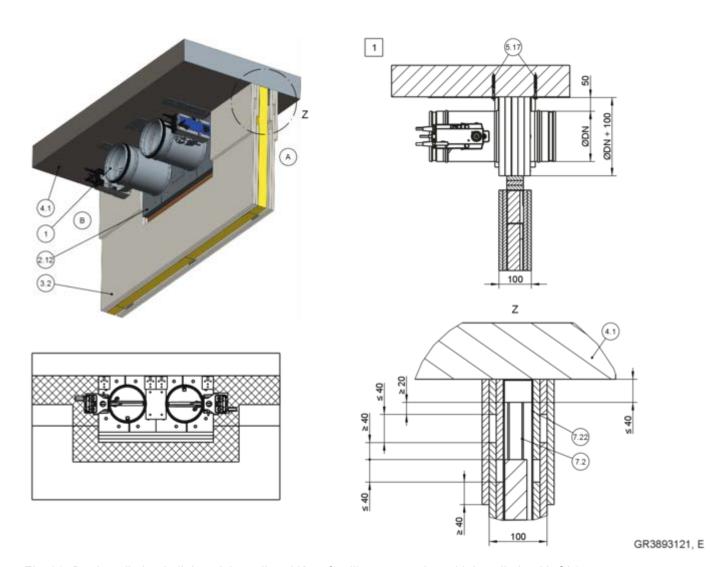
Dry installation in lightweight wall and Knauf ceiling connection with installation kit GL2
